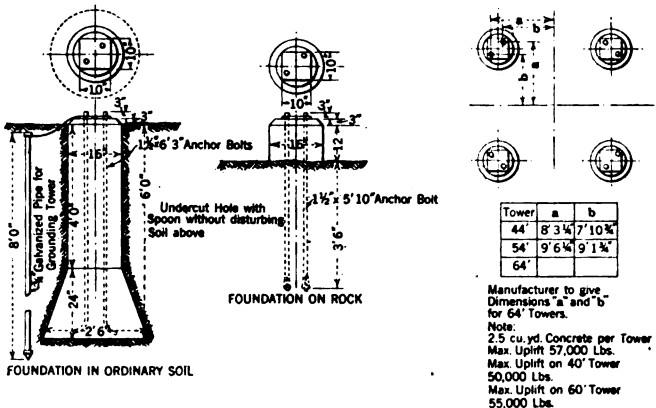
MUSHROOM TYPE CONCRETE FOUNDATION
